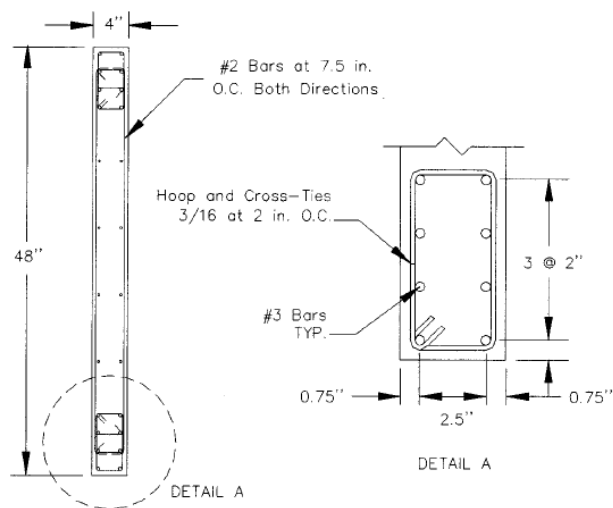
RW2 wall cross-section and reinforcement (after Thomsen and Wallace, 1995)
